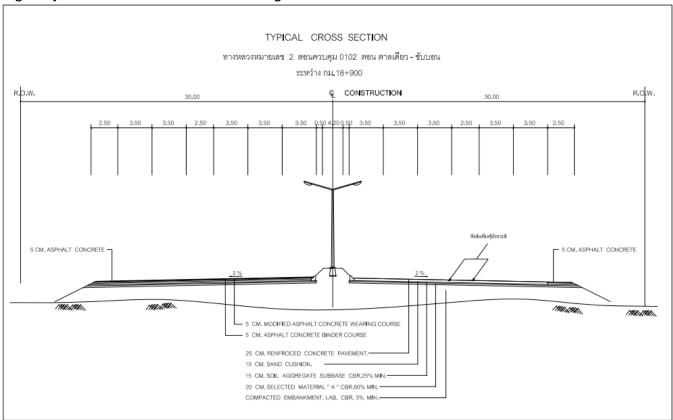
Cross-section of the Mittrapab Highway at km 18+900
